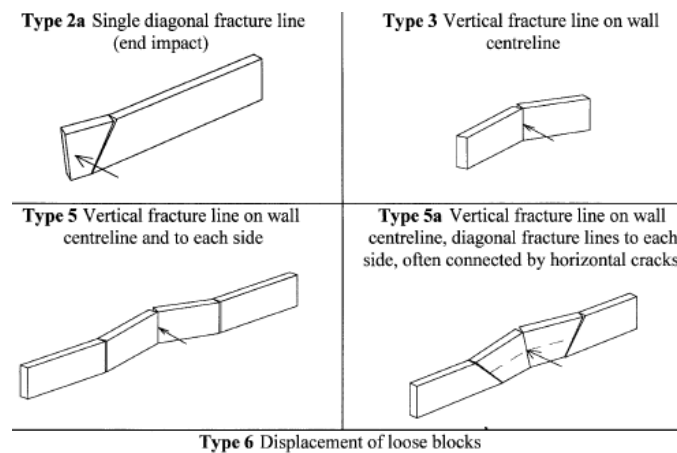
Observed post-test failure mechanisms in parapets, supported at the bottom and sides [28].
